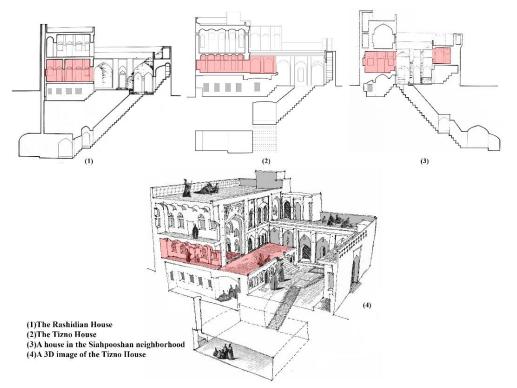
The Fourth Layer: Platform (*Mahtabi*) or Terrace and the First-floor rooms (Source: Authors)
